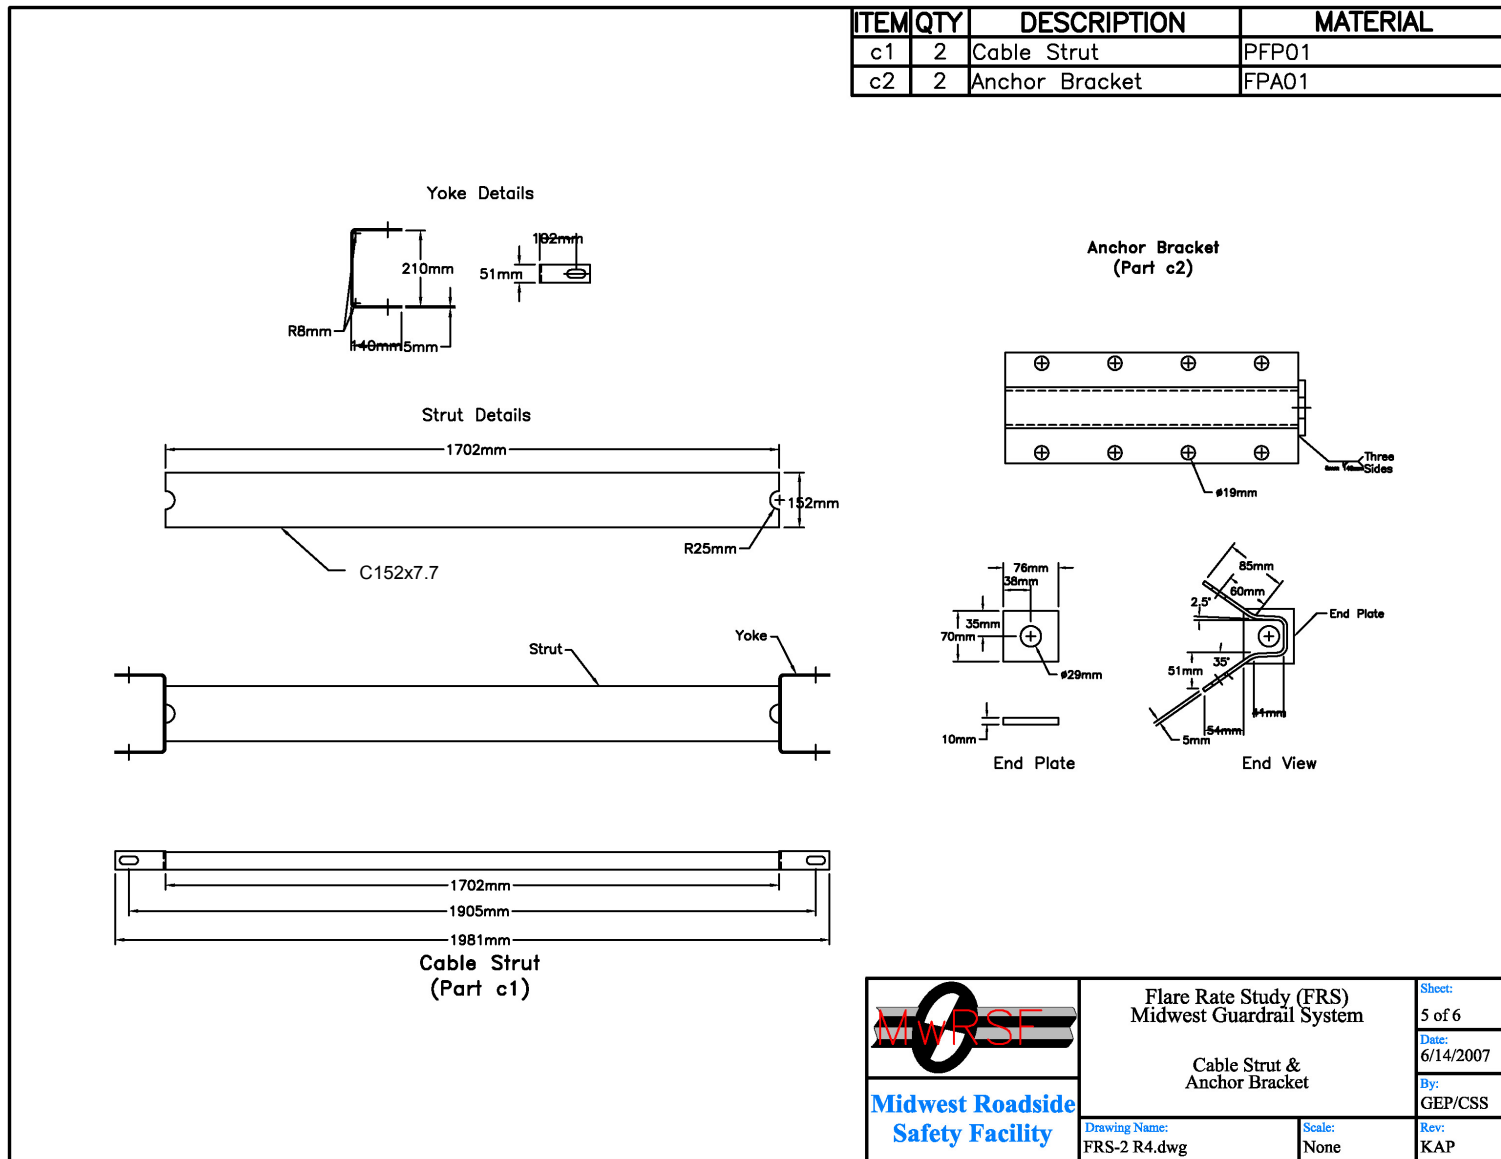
Anchorage Details, Design No. 2 (Metric)
